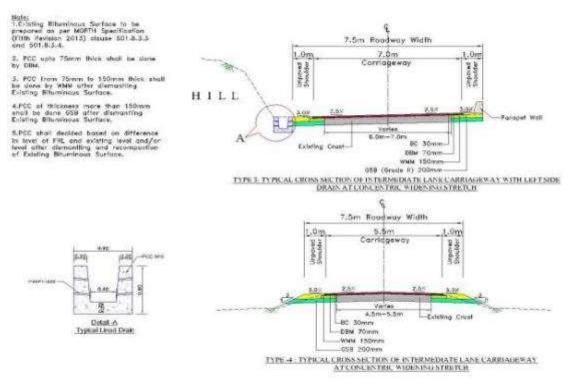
Typical Cross-Section of intermediate Lane carriageway with Left side drain and intermediate Lane carriageway at concentric widening Stretch
